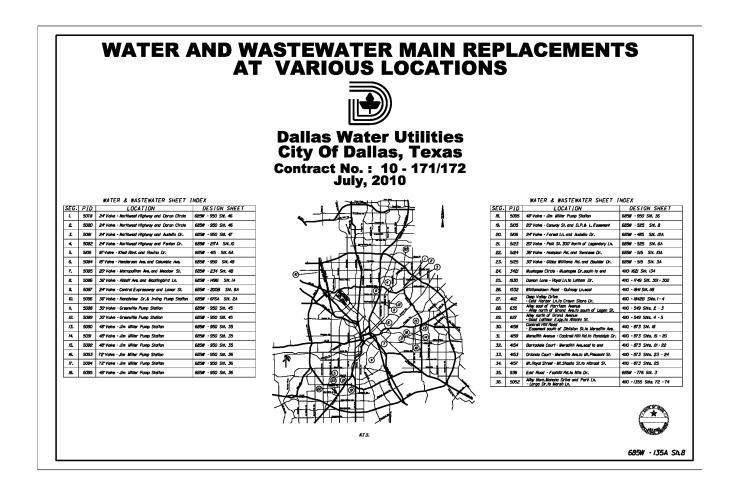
TYPICAL COVER SHEET FOR A MULTIPLE LOCATIONS PROJECT
